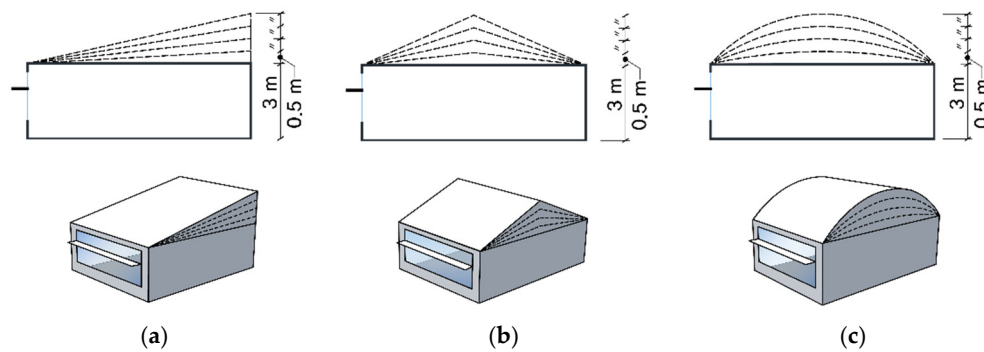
Configuration of ceiling types for light shelf performance evaluation: (a) sloped ceiling; (b) gable ceiling; (c) curved ceiling.
